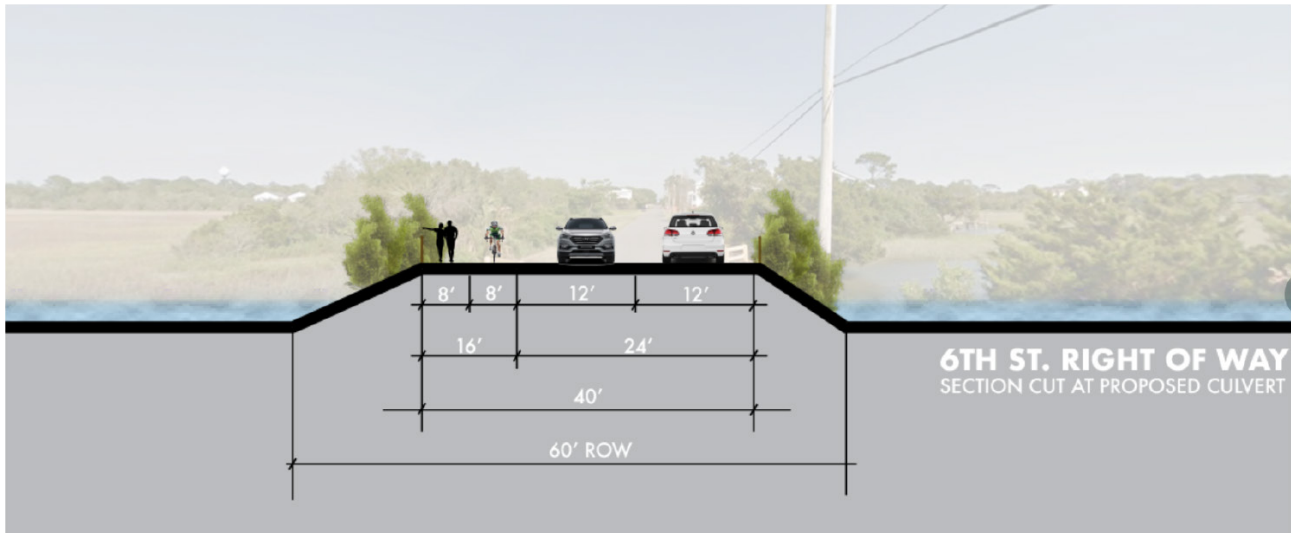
Cross-section of the existing and the proposed culvert at 6th Street. Dimensions shown are in feet.
